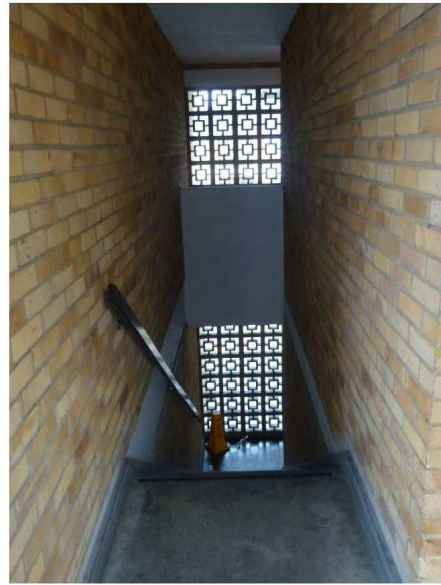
Tanner House - Balcony access arrangement to the rear of the block
